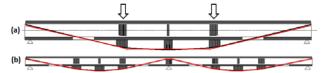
High eccentricity tendon profile configuration – (a) Simply supported beam (b) Statically indeterminate beam
